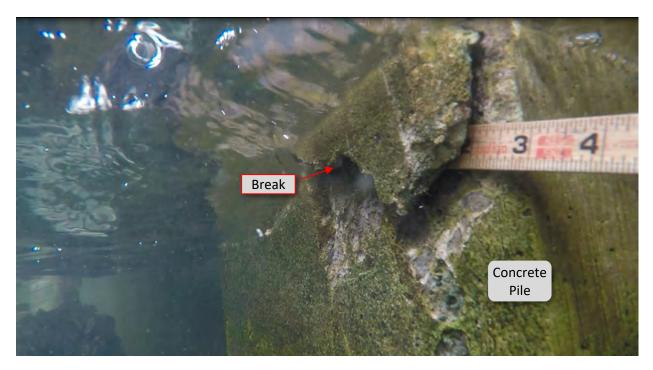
P37. STA 5+56. Cracks/spalls at east flange at pile and loss of concrete. Underwater view.
